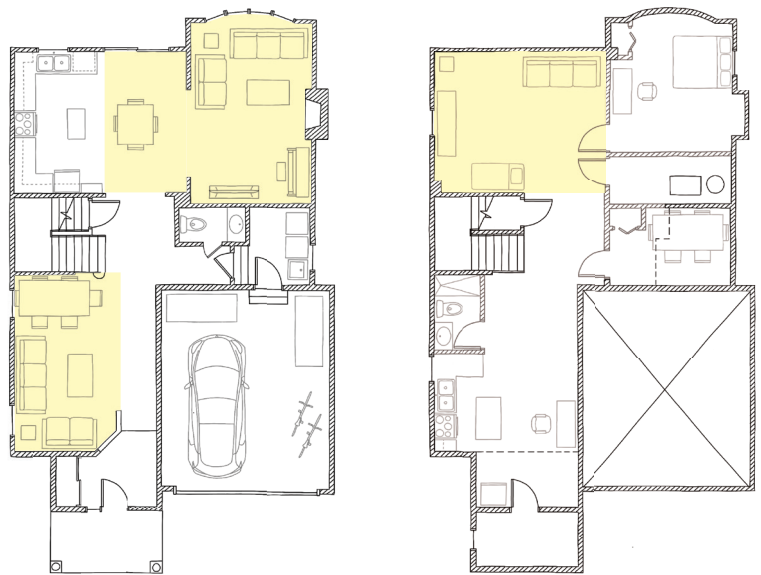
Left to right:* Living/dining rooms repeated across the ground & basement floors of the Milton house.
